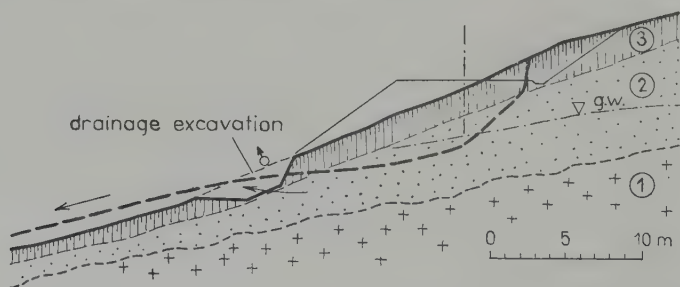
Ground water stored in sand (2) under a layer of clayey slope loam (3) gushed out after the excavation of a trench; the water current washed out the sand and the slope was severely disturbed; 1 — granite.
